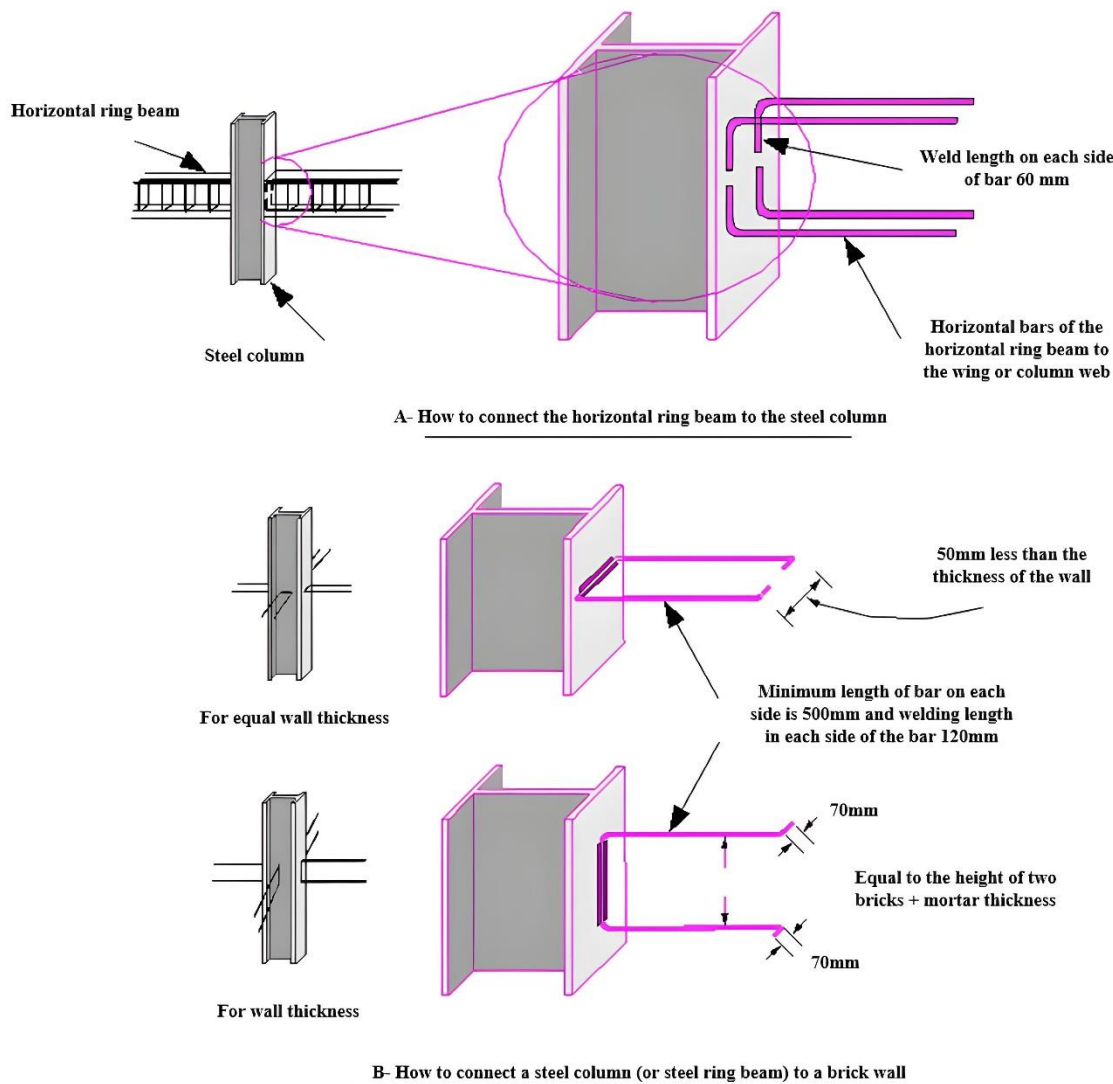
The details of connecting the horizontal ring beam and the brick wall to the steel column according to the 2800 Standard
